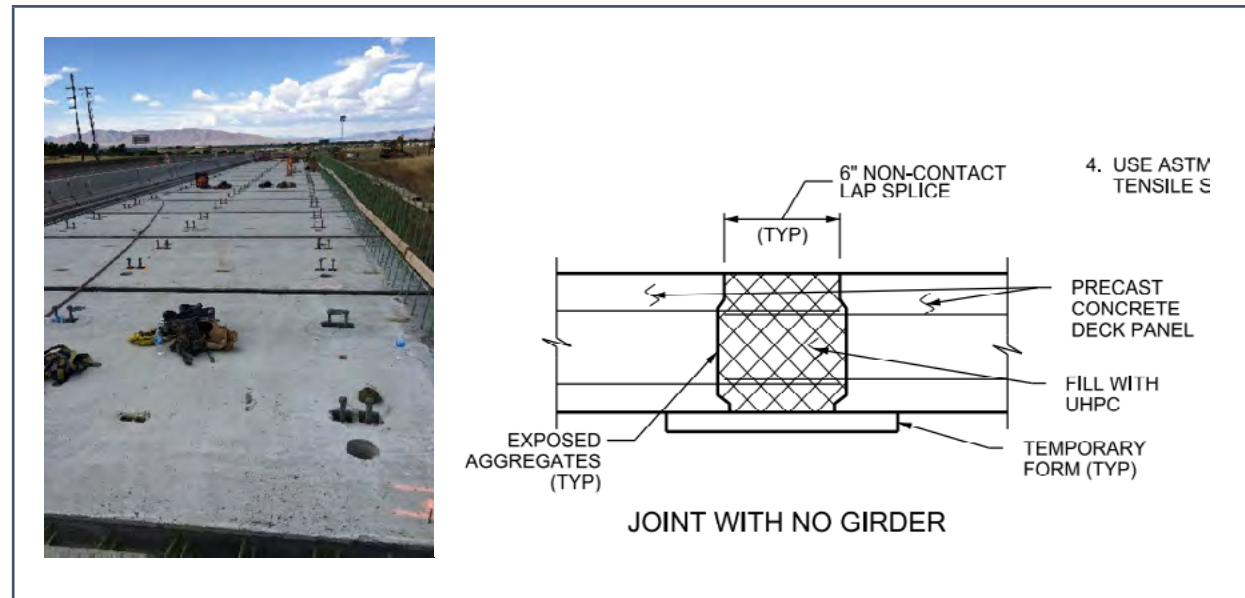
Transverse full depth precast concrete panel joints with UHPC from Utah
